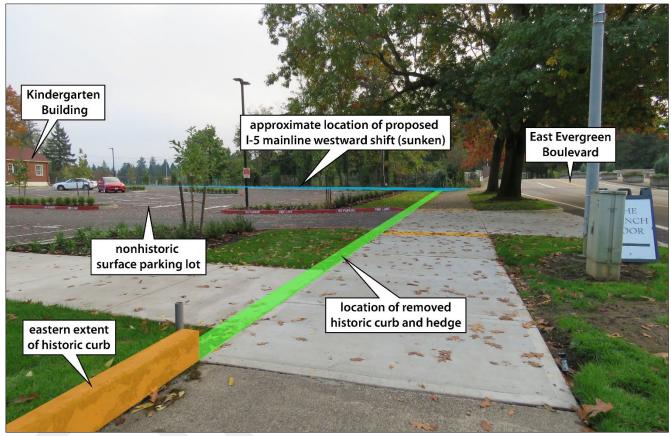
View of the southeast corner of the House of Providence property, facing northeast (ARG, October 2023). This view shows the sidewalk and parking lot along East Evergreen Boulevard, with the Kindergarten Building just visible at the left edge of the frame. The orange shading indicates the eastern extent of the extant historic curb, and the green shading denotes the location of the historic hedge and curb section that have been removed. The blue shading denotes the approximate location of the western edge of the I-5 right of way that is contemplated as a design option of the Modified LPA.
